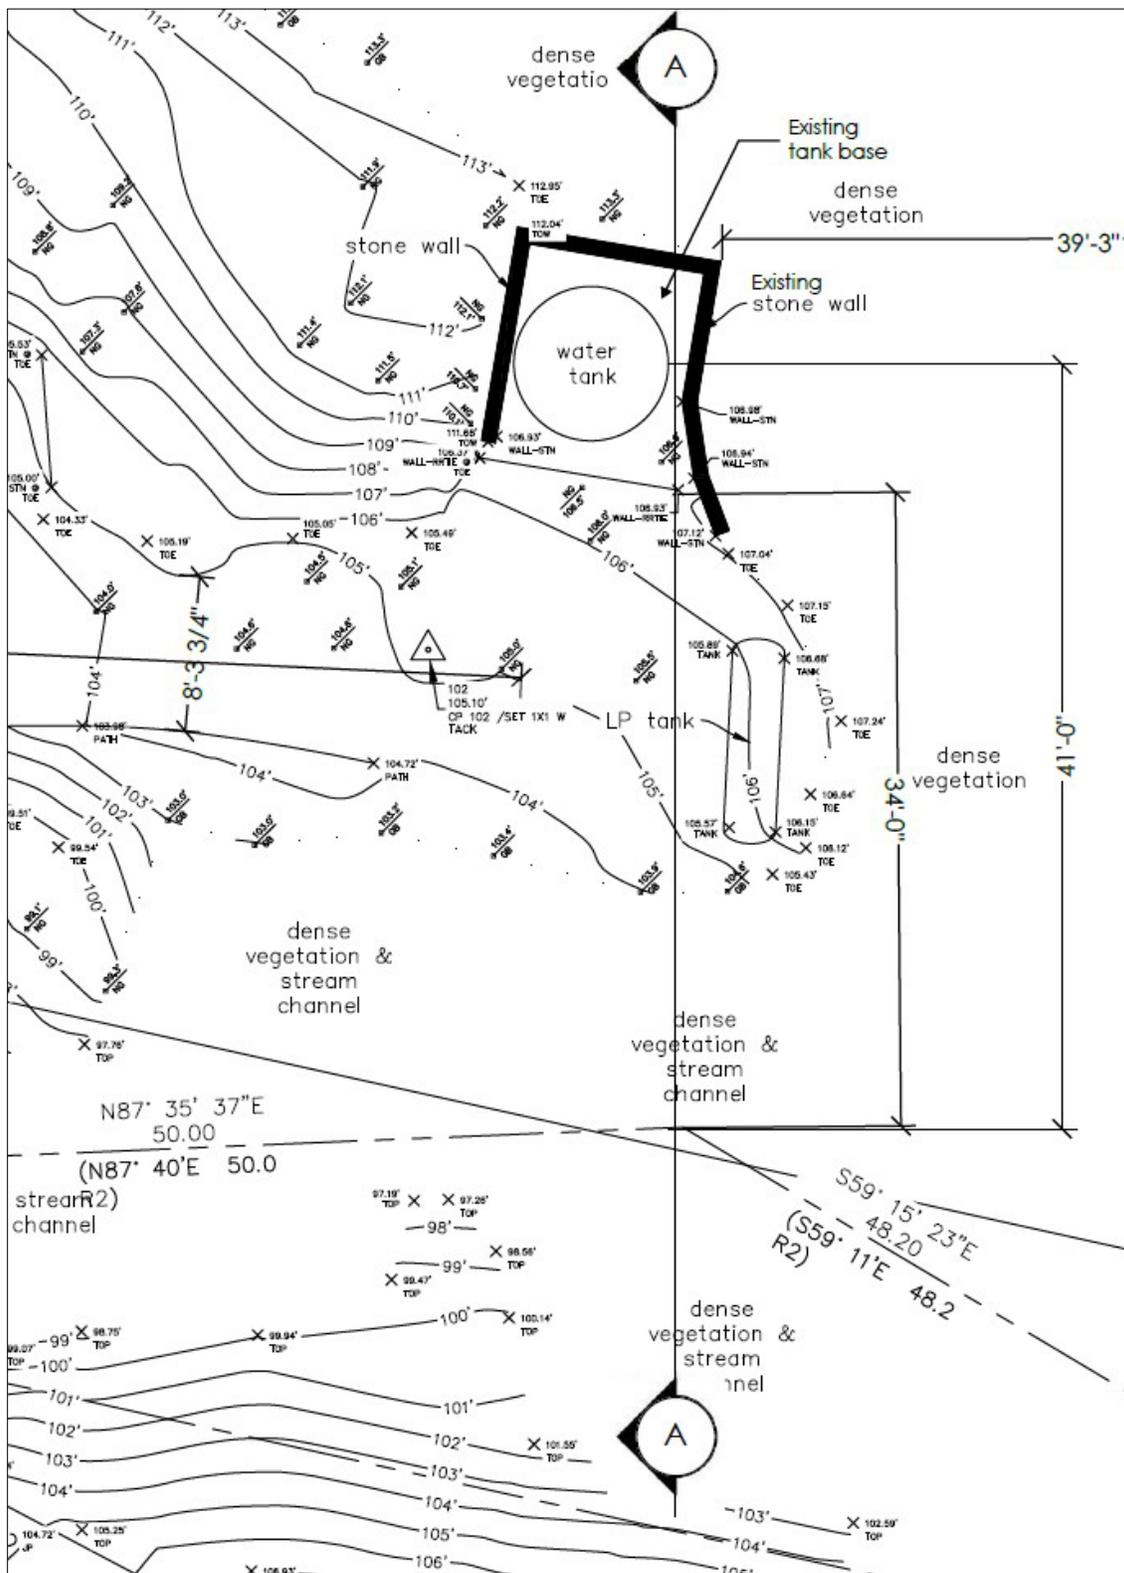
A portion of the site plan by Rasmussen Land Surveying, July 2025.
